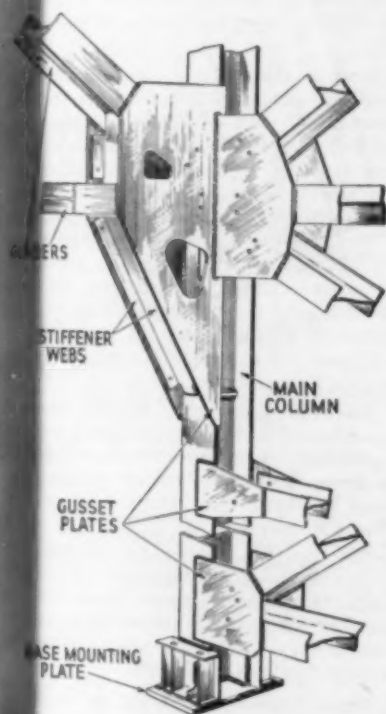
Construction detail of main column at base foundation showing welded assembly of girders to column.
